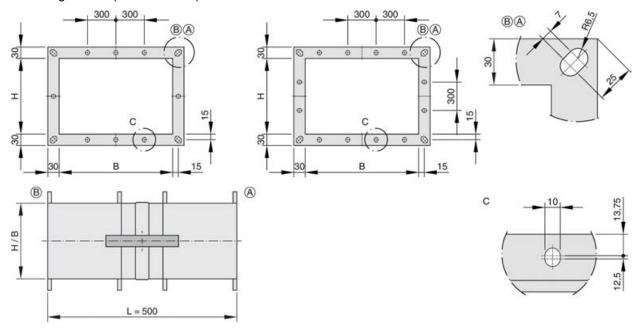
Flange holes L = 500 mm – uneven and even number of holes
